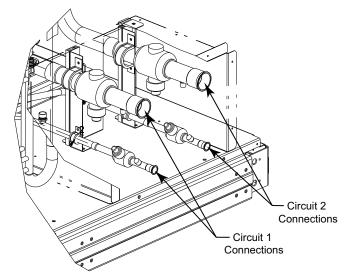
569L*16-25(T,U) Service Valve Locations
